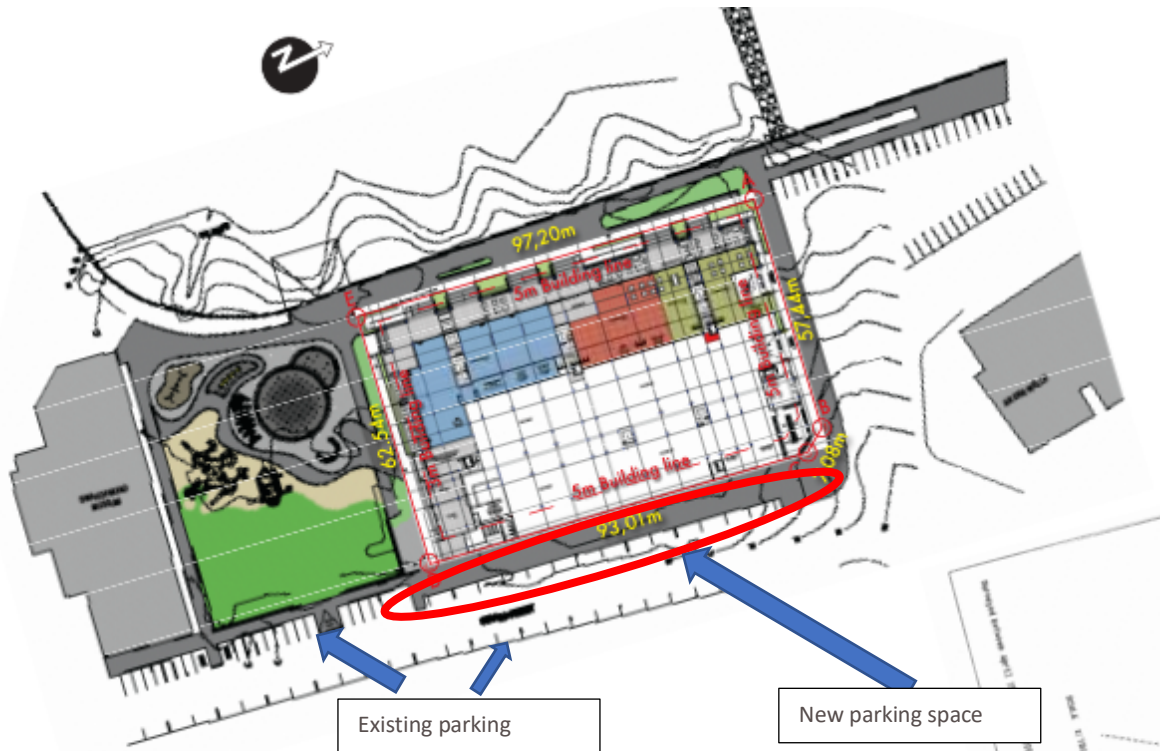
DIAGRAM INDICATING ON-STREET PARKING SPACES OUTSIDE THE BUILDING
